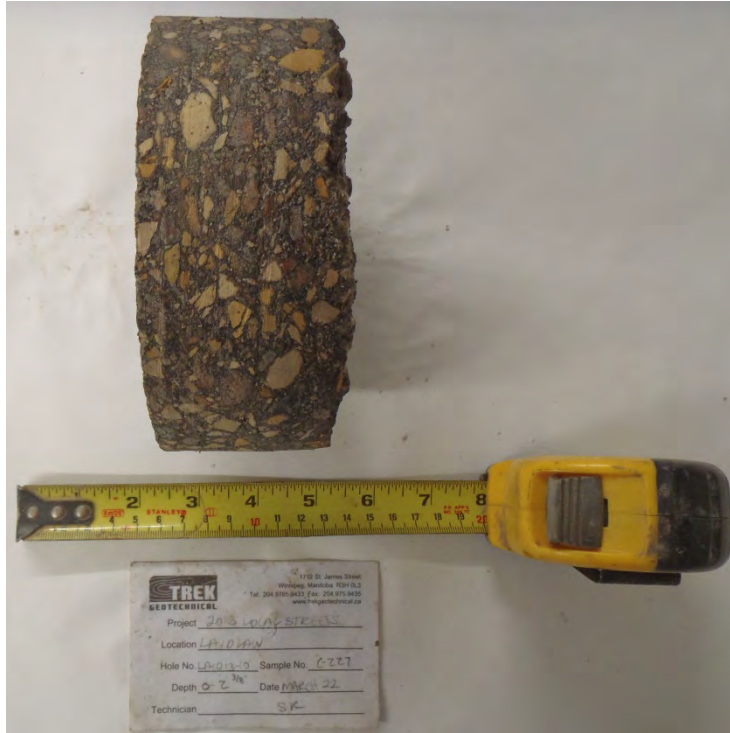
Asphalt Core Sample from Test Hole LAID13-10
